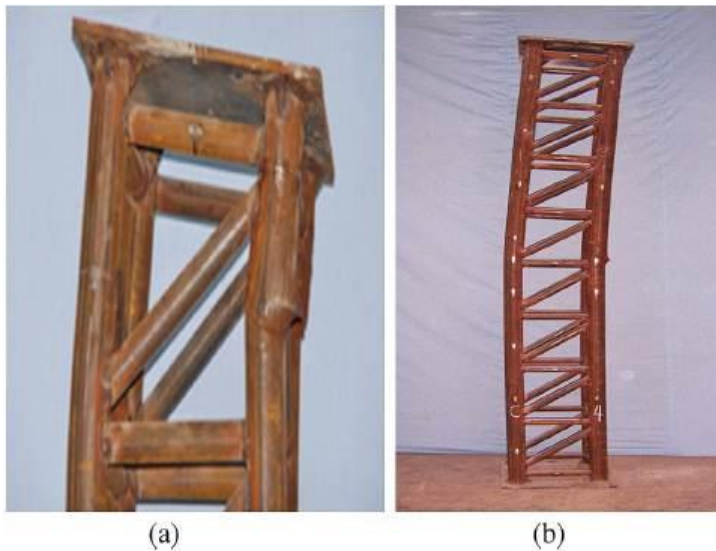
Test photos: a) Buckling near end of the specimen; b) typical failure of the whole column (Ou et al., 2011)
